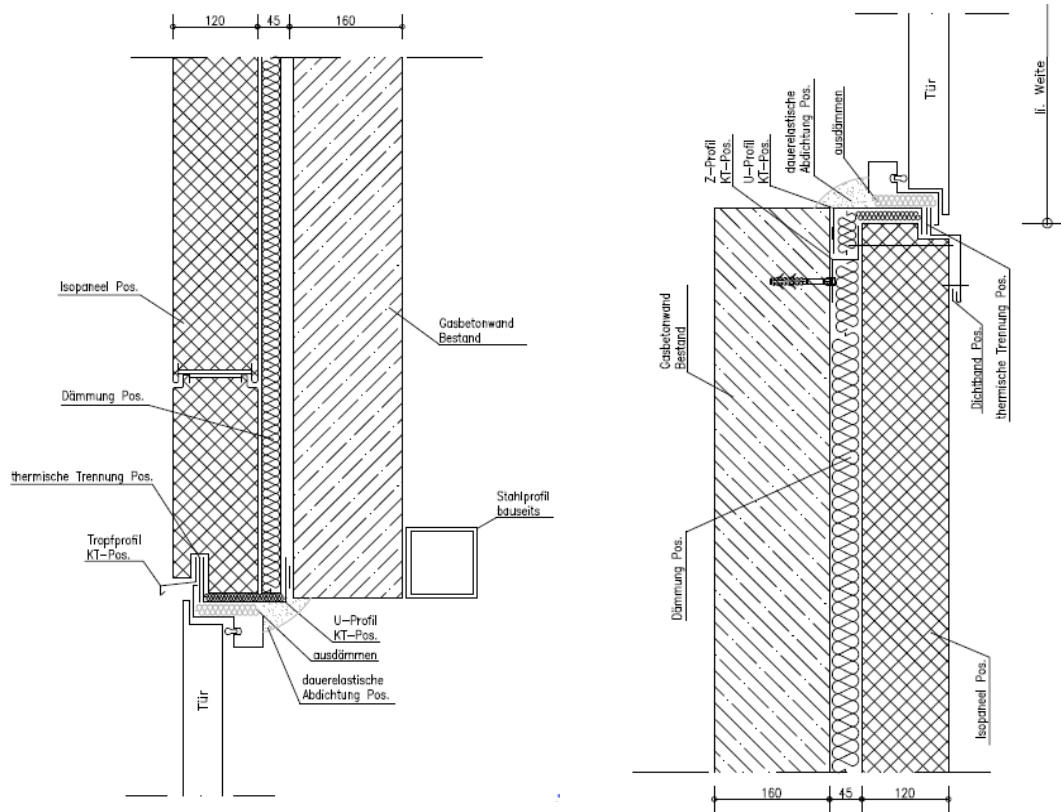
Details for use of steel sandwich panels for overcladding, junction door – façade (left: top, right: lateral)
